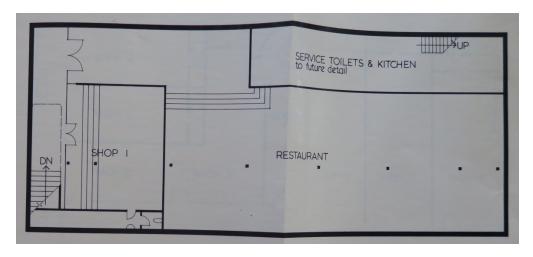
, DA Plan 1969 - Lower Ground Floor. Showing the space set aside for D'Arcy's restaurant, plus an additional Shop 1, facing the under-croft to Bay Street.
